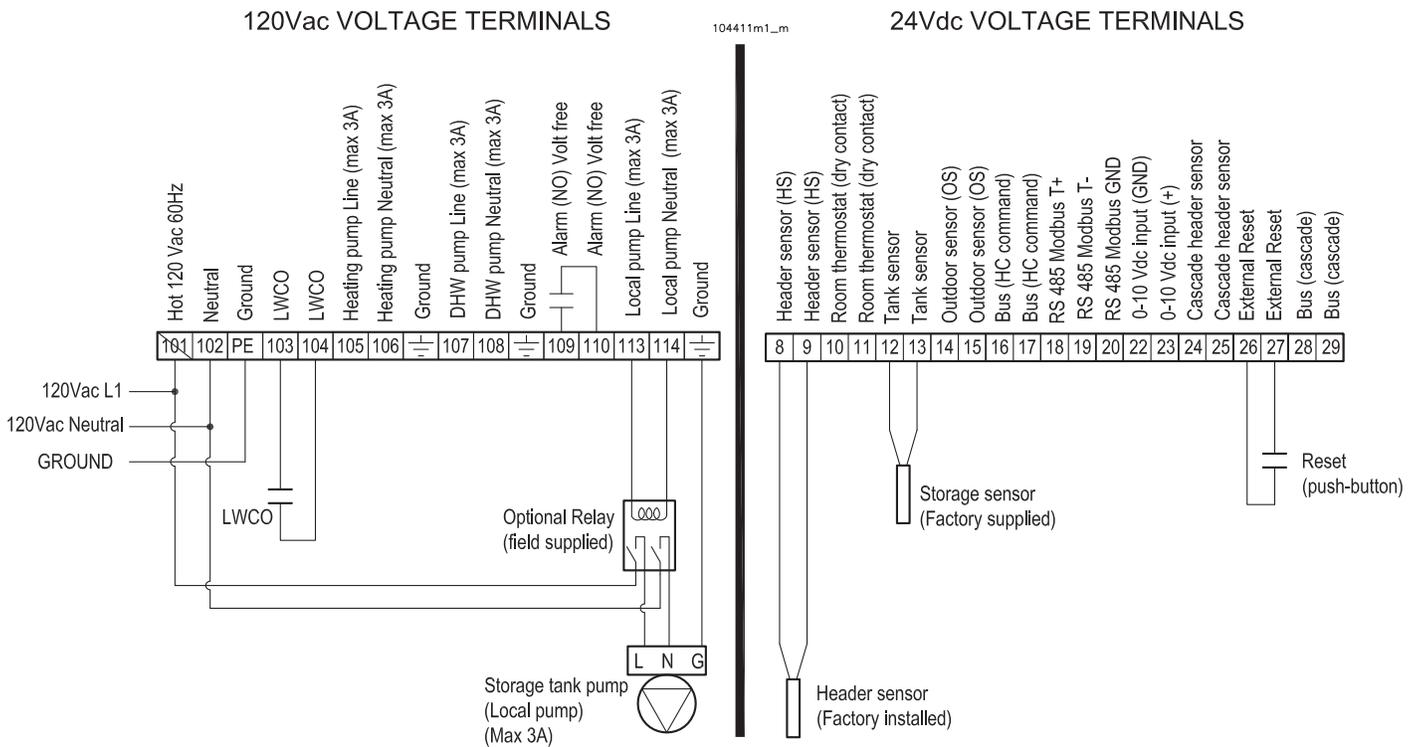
Electrical customer connection for IW water heaters connected to big storage tank (see section 8.2.6, letter a)
